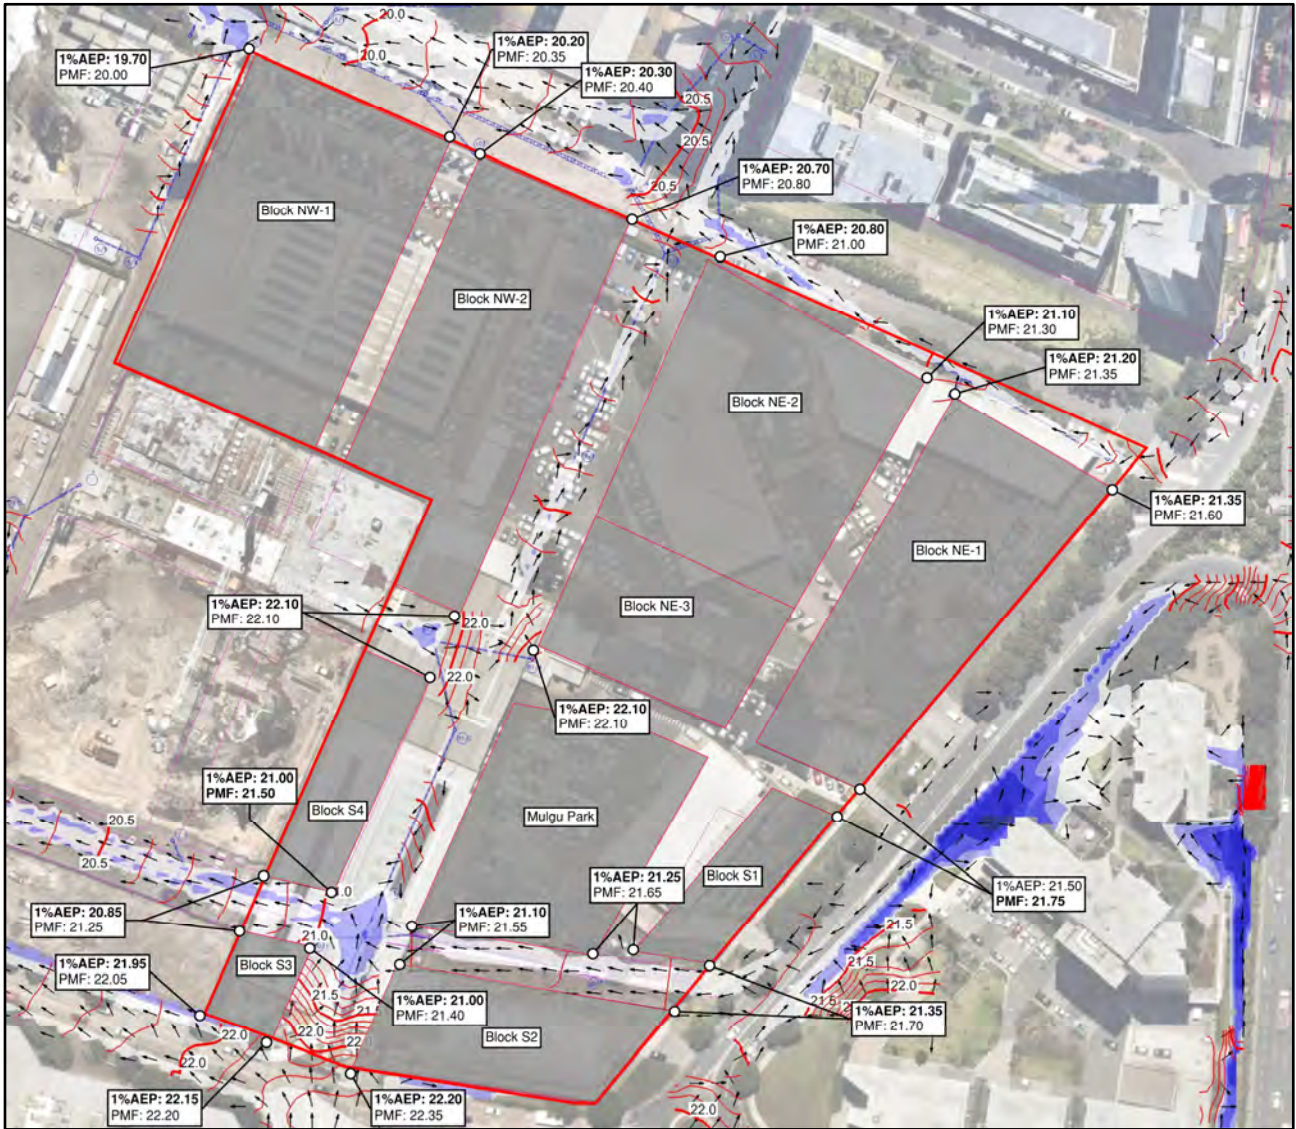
Flood Levels at Building Block Corners for Flood Planning Levels (Overlaid on 1% AEP results)
